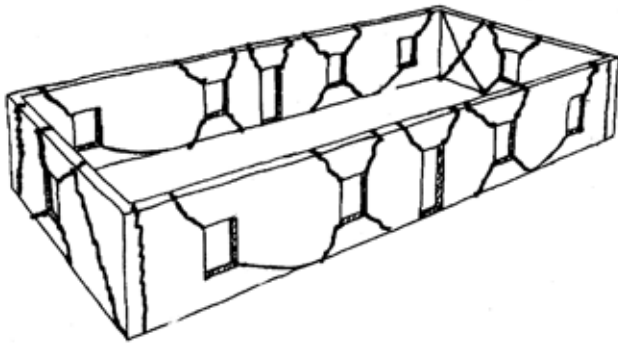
Typical predictive crack pattern for identification of wall sections that will require stabilization during strong ground motions.
